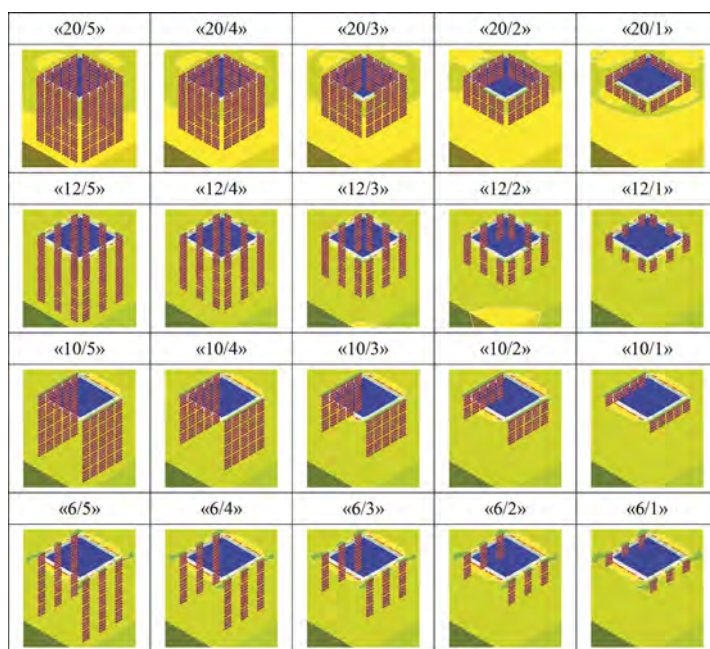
Arrangement schemes of reinforcement elements when strengthening shallow foundation with contour reinforcement.
